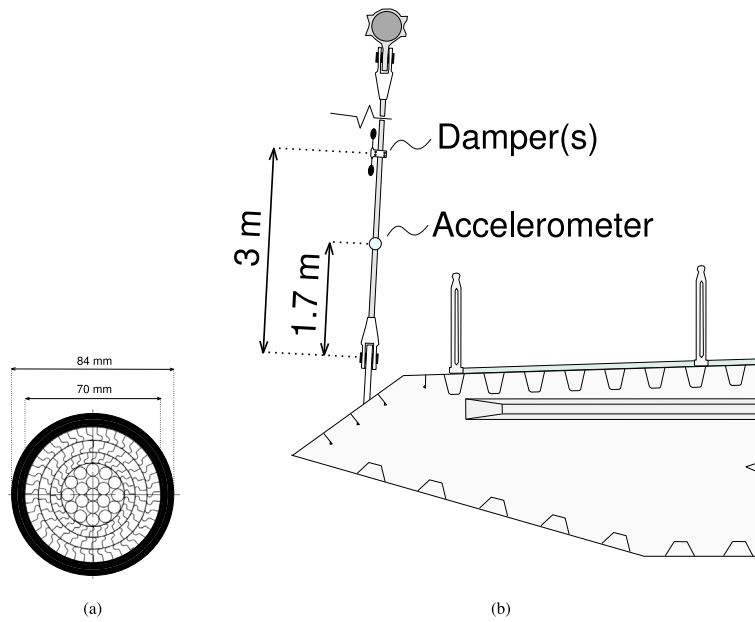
(a) Dimensions of the locked-coil hanger with sheeting and (b) placement of accelerometers and damper.
